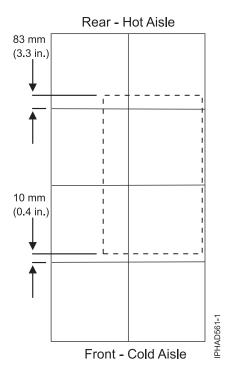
Rack placement for 600 mm (23.6 in.) tiles
